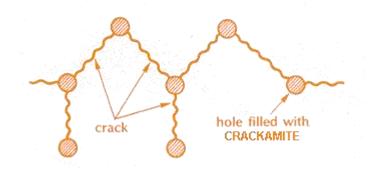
Sectional-view of the crack formation in material with two free surfaces
